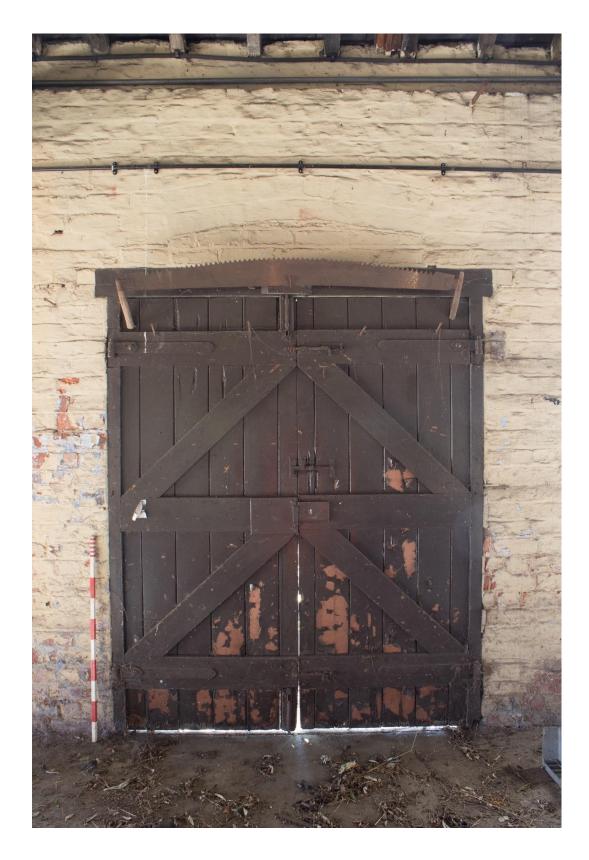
Double doorway with brick arch lintel in south wall, 1m scale
